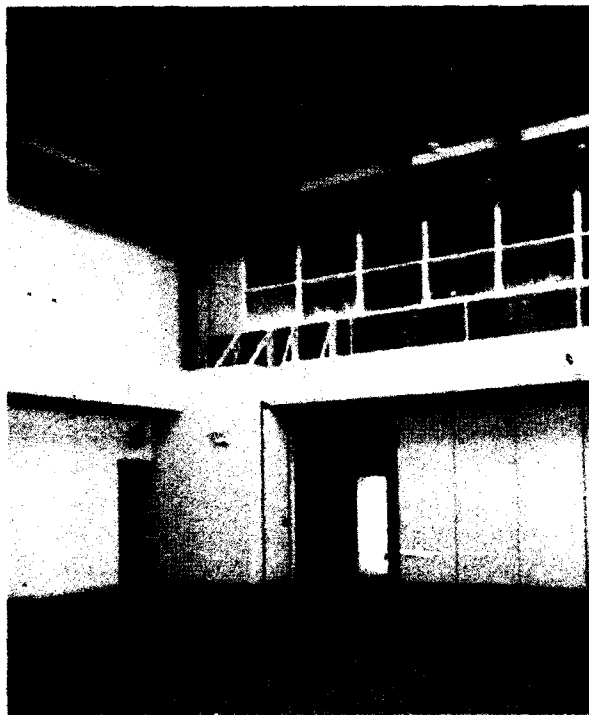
Moveable partitions, clerestory windows and exposed glue-laminated wood framing
